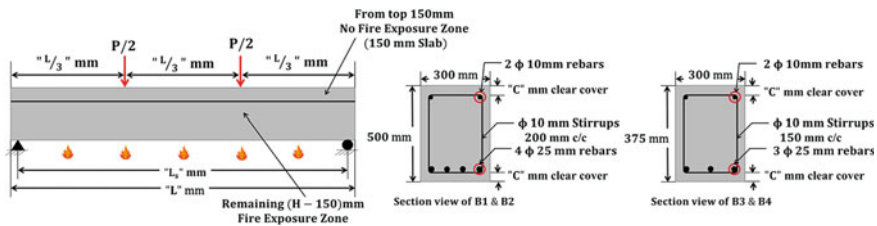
Beam sectional profile detail of typical RC beams selected for parametric study
